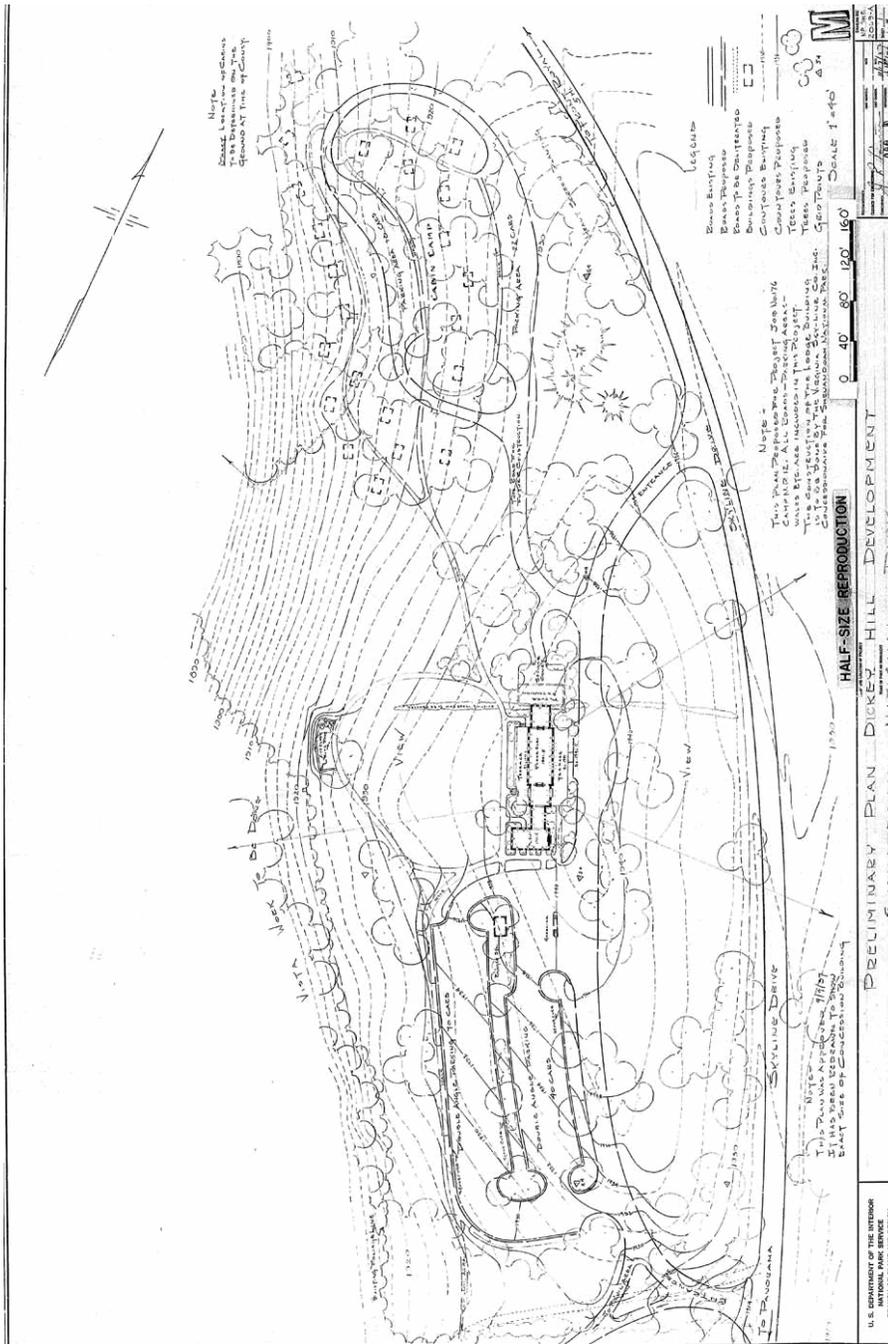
Preliminary site plan of Dickey Ridge Lodge, cabins and parking, 1937. The plan showed an old road by the proposed parking area and a hedgerow running through the proposed lodge footprint (SHEN 134-2069, Denver Service Center).
